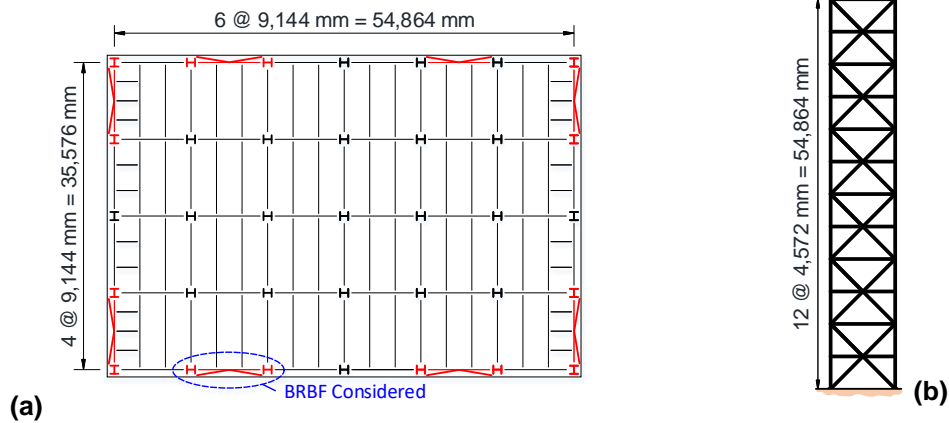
Twelve-story NIST building archetype: (a) floor plan and (b) elevation of BRBF.
